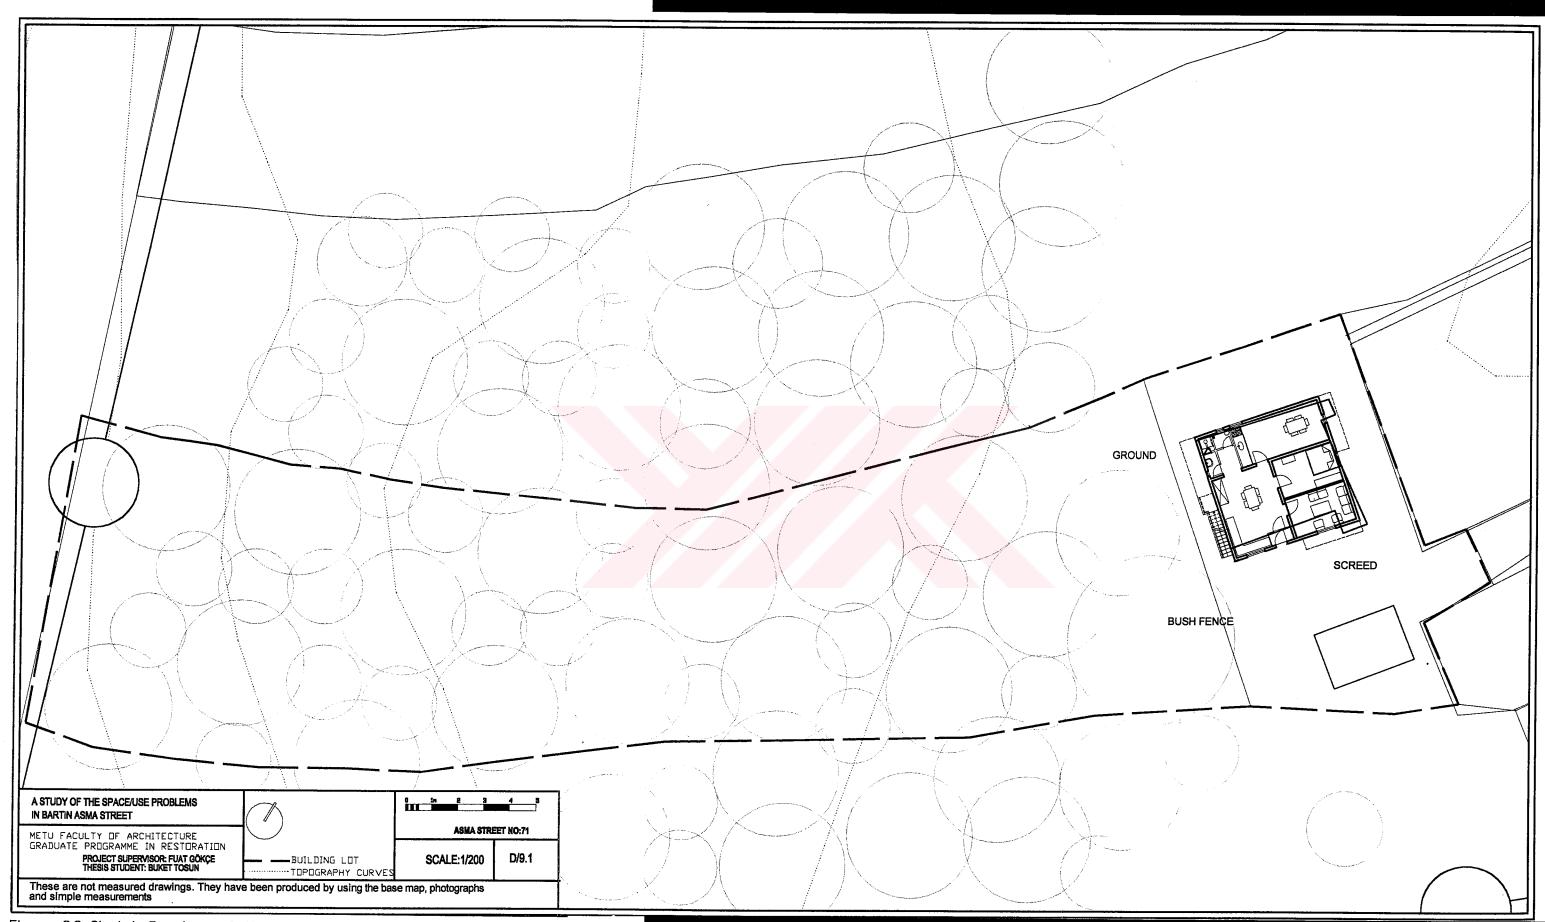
Sketch Drawings of the Building Lot of Building No.71
